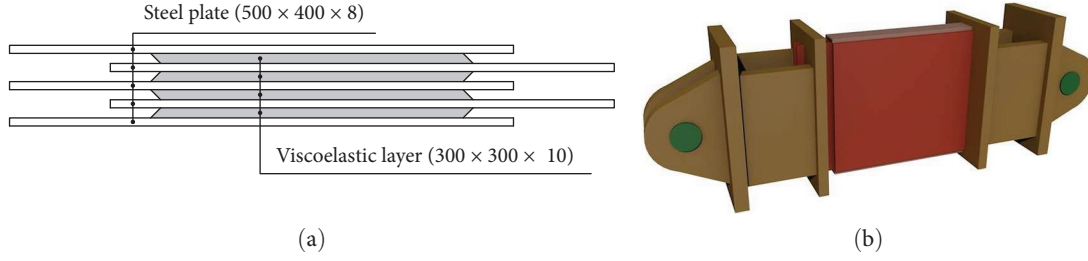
Schematic drawing of MLVED: (a) inner section and (b) 3D assembled MLVED.
